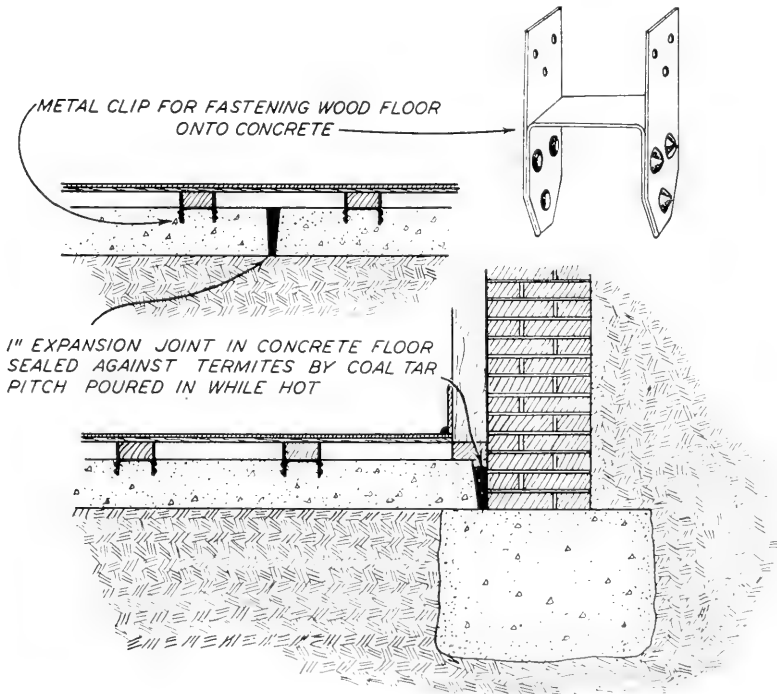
Expansion joints between sections of concrete and between concrete and masonry wall sealed against termite entry with hot coal tar pitch. This type of seal is very simple yet effective in protecting a building at a common point of termite entry. The clip illustrated is one of many types manufactured for the purpose of fastening sleepers to concrete floors, thereby eliminating the older method of embedding these timbers in concrete. An alternative type of joint is shown in fig. 13.
